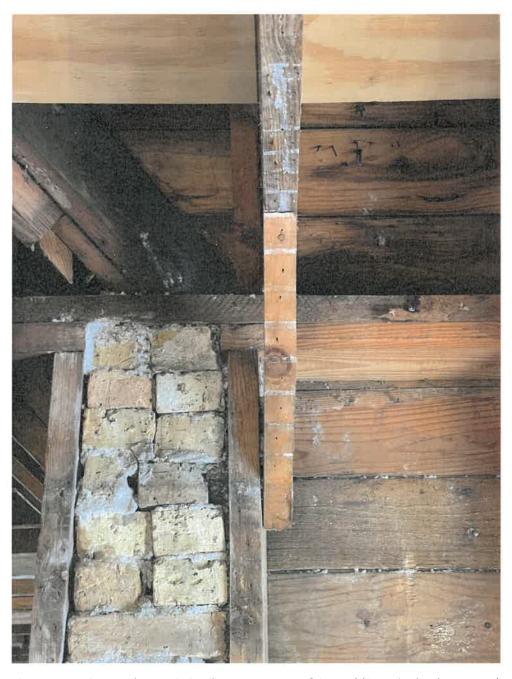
South Wing (Second Floor) – Intersection of Central (2-wythe brick masonry) Wing with South (wood framed) Wing at roof valley. Indeterminate bearing point for valley framing, evidence of charred valley rafter from prior fire, efflorescence at brick wall and evidence of moisture damage at wood framing members
